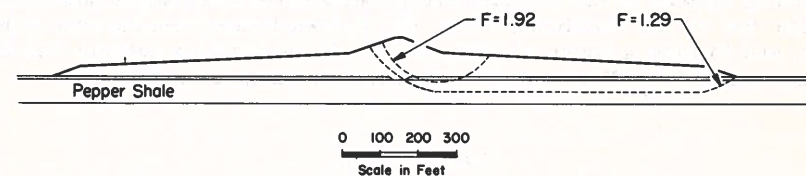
ANALYSES OF RECONSTRUCTED SECTION OF WACO DAM
